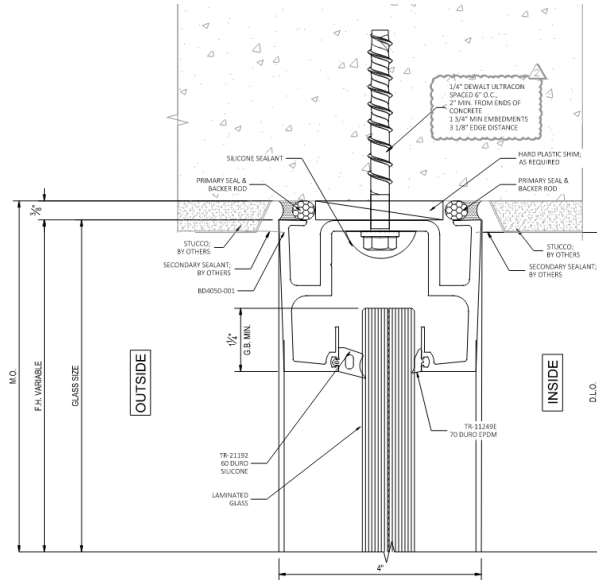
Head detail of laminated glass balcony divider panel anchored at the slab edge.
